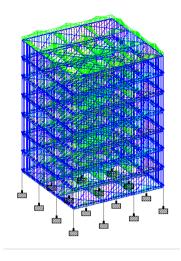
Assigning of Exterior Wall Load (19.69KN/m)
